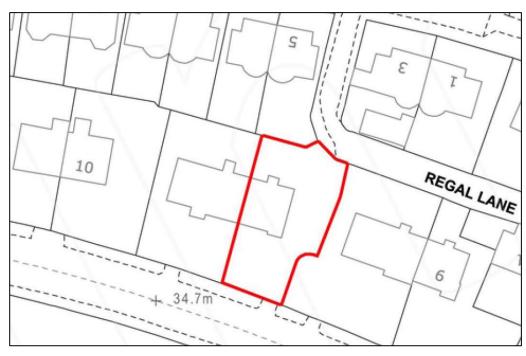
(above): Existing site plan demonstrating the spaciousness of the gap between Nos. 7 and 8.
